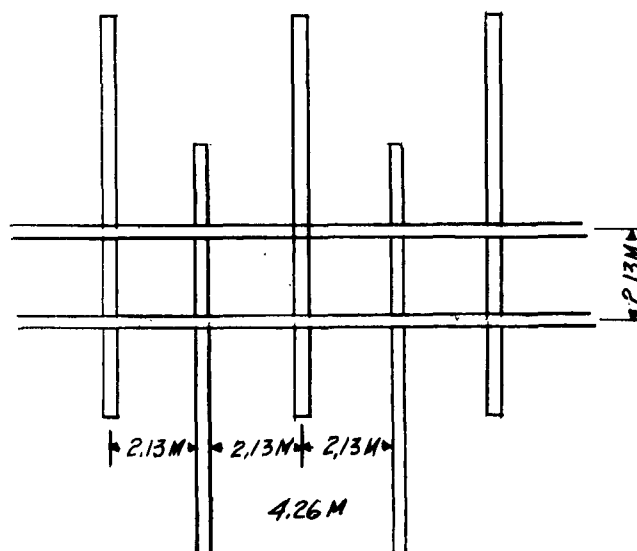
Scheme of laying cross beams on top of cut off pickets
